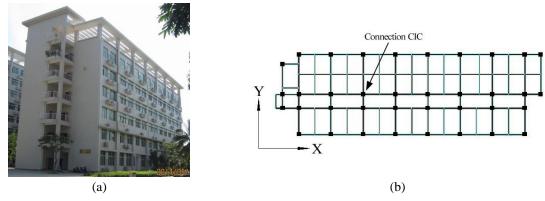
Prototype building and Connection CIC: (a) photograph; (b) second floor plan
